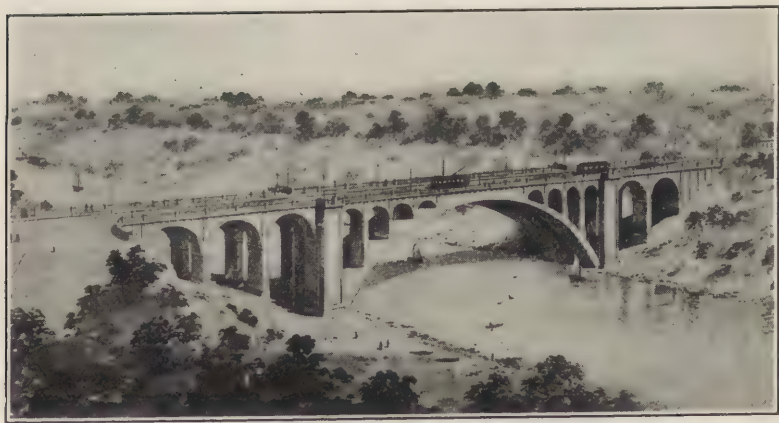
Concrete Arch Bridge with Open Spandrels. Rocky River, Cleveland, Ohio.
